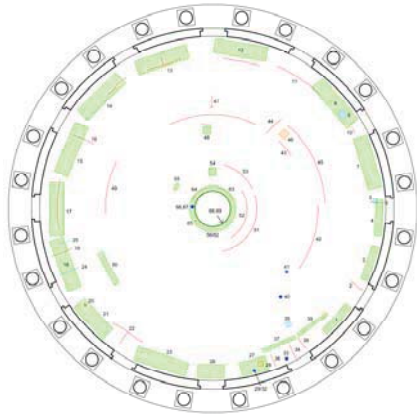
Visual Inspection Summary (Green: Honeycombed Concrete; Red: Cracking)
